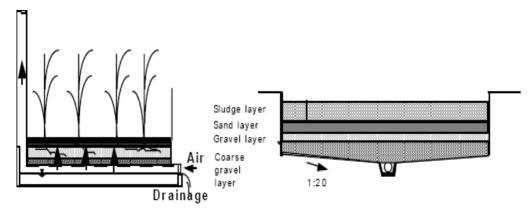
Schematic diagram of planted and unplanted sludge drying beds
